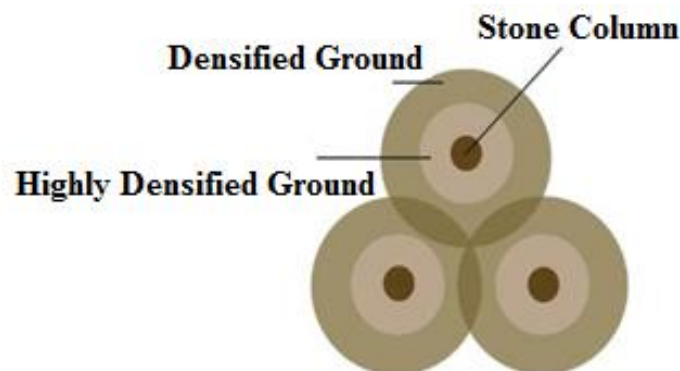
Possible zone improvement of grouped stone columns (McCabe, 2007)
